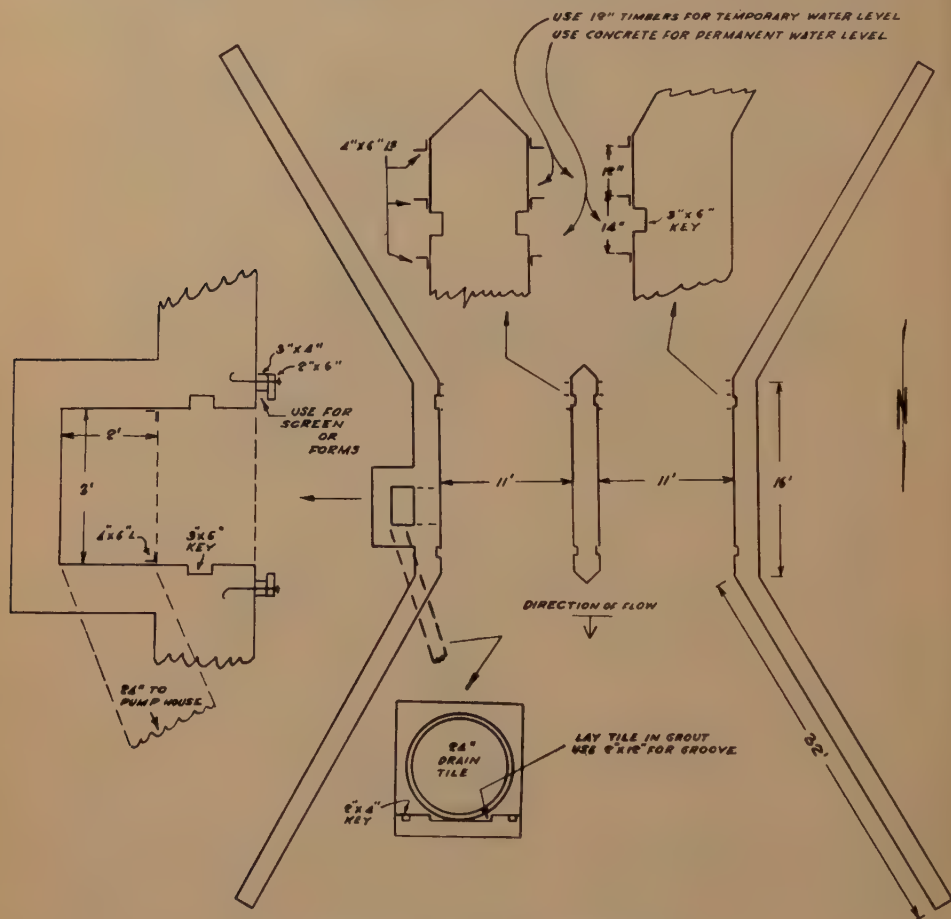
GENERAL PLAN, DAVIS CREEK OVERFLOW.
